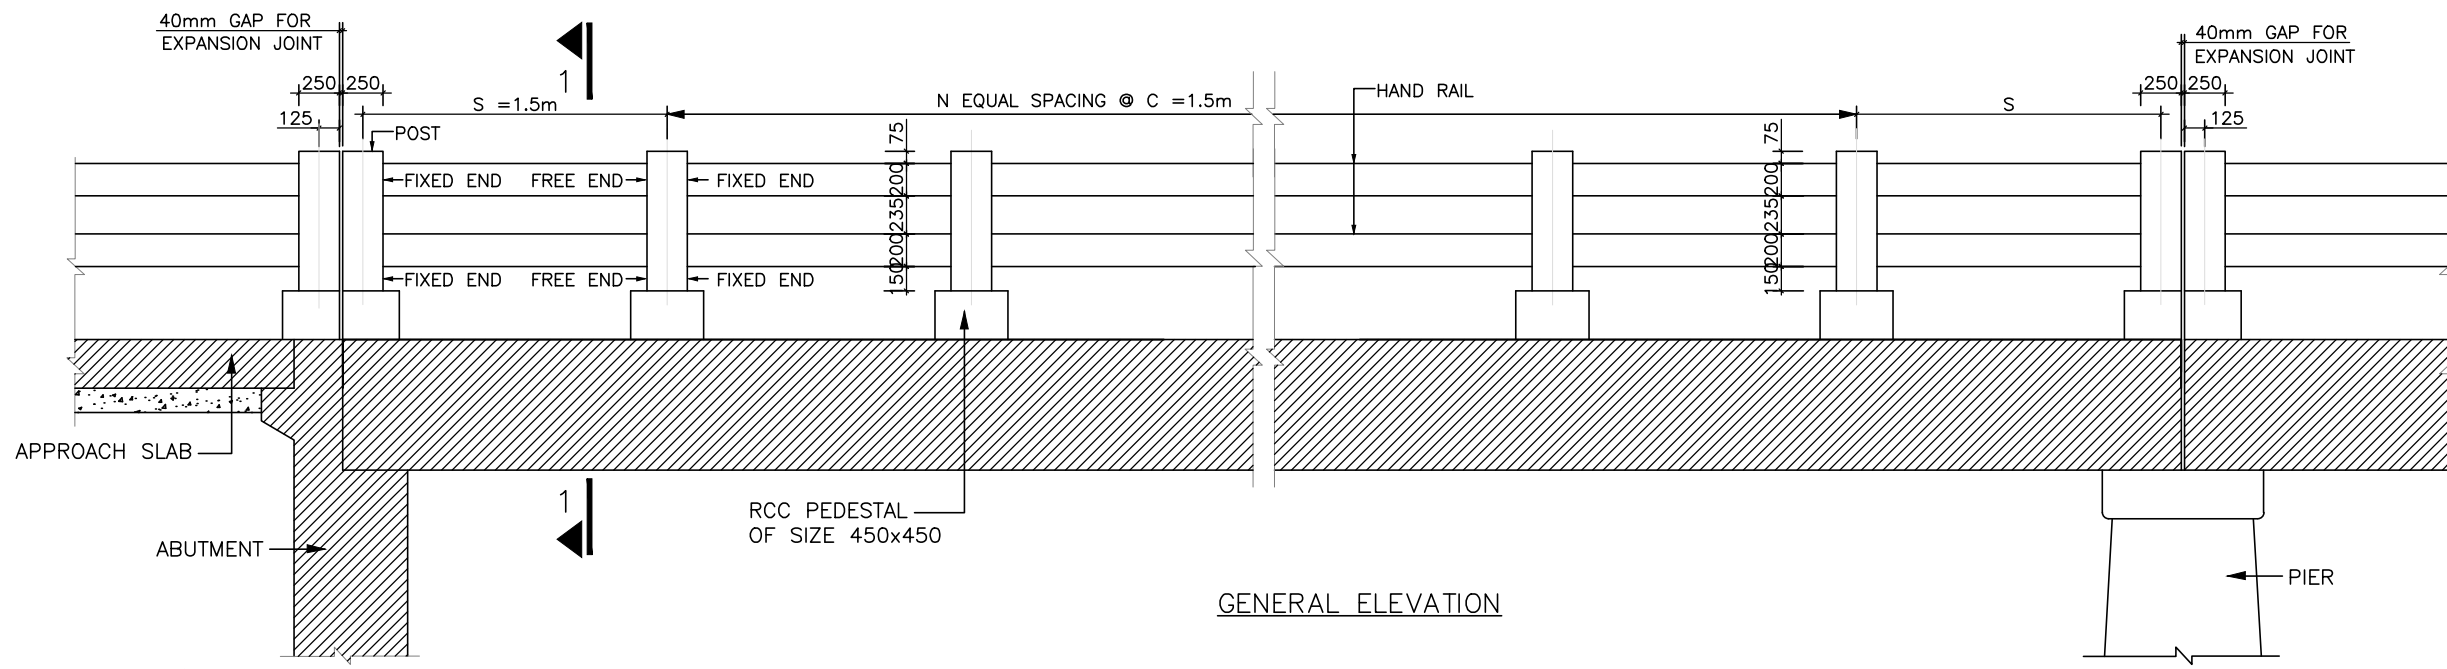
DETAILS OF CRASH BARRIER FOR SOLID SLAB
